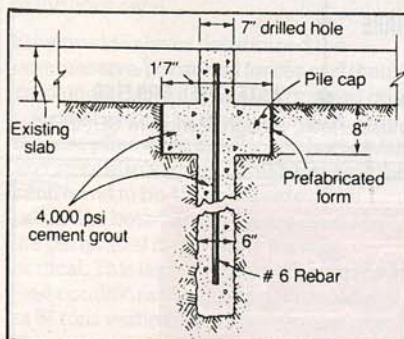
Schematic arrangement of minipile and existing base slab. Coney Island, NY (Munfakh and Soliman, 1987).
